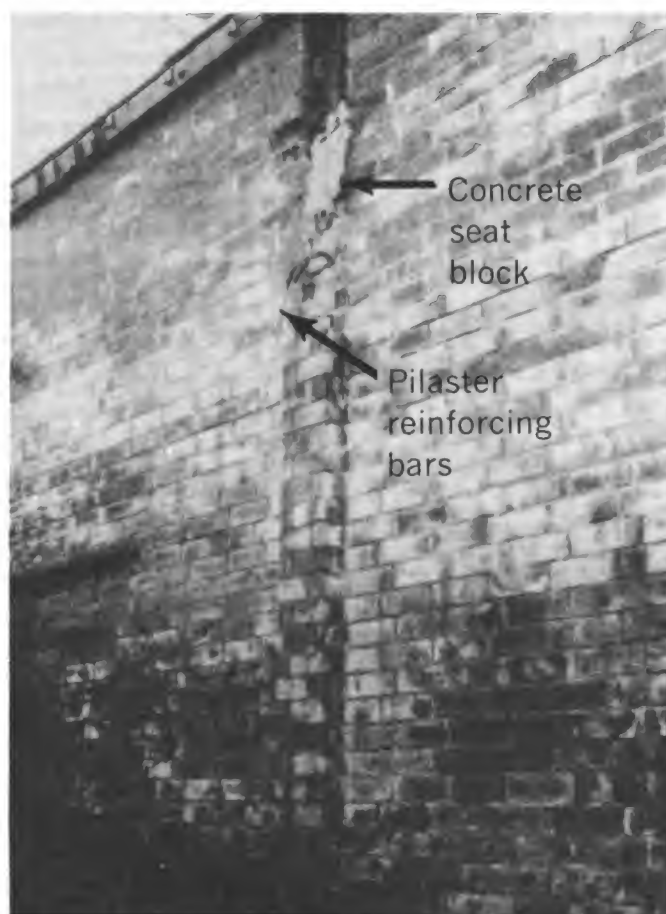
Boys Market. Closeup of roof beam seat. Note broken concrete bearing block and reinforcing bars which are bent down the wall. LeRoy Crandall & Associates photograph.
